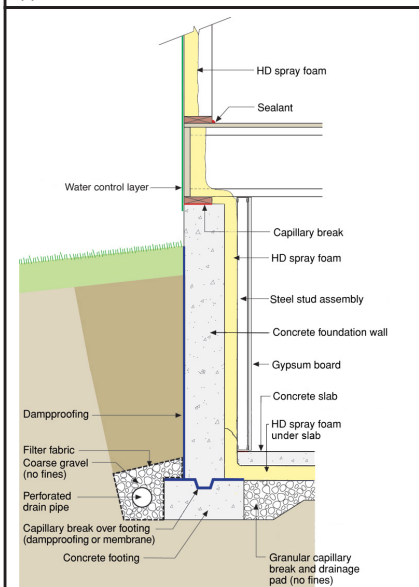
Spray foam insulation can be directly applied to the interior of concrete foundation walls and under basement floor slabs.
